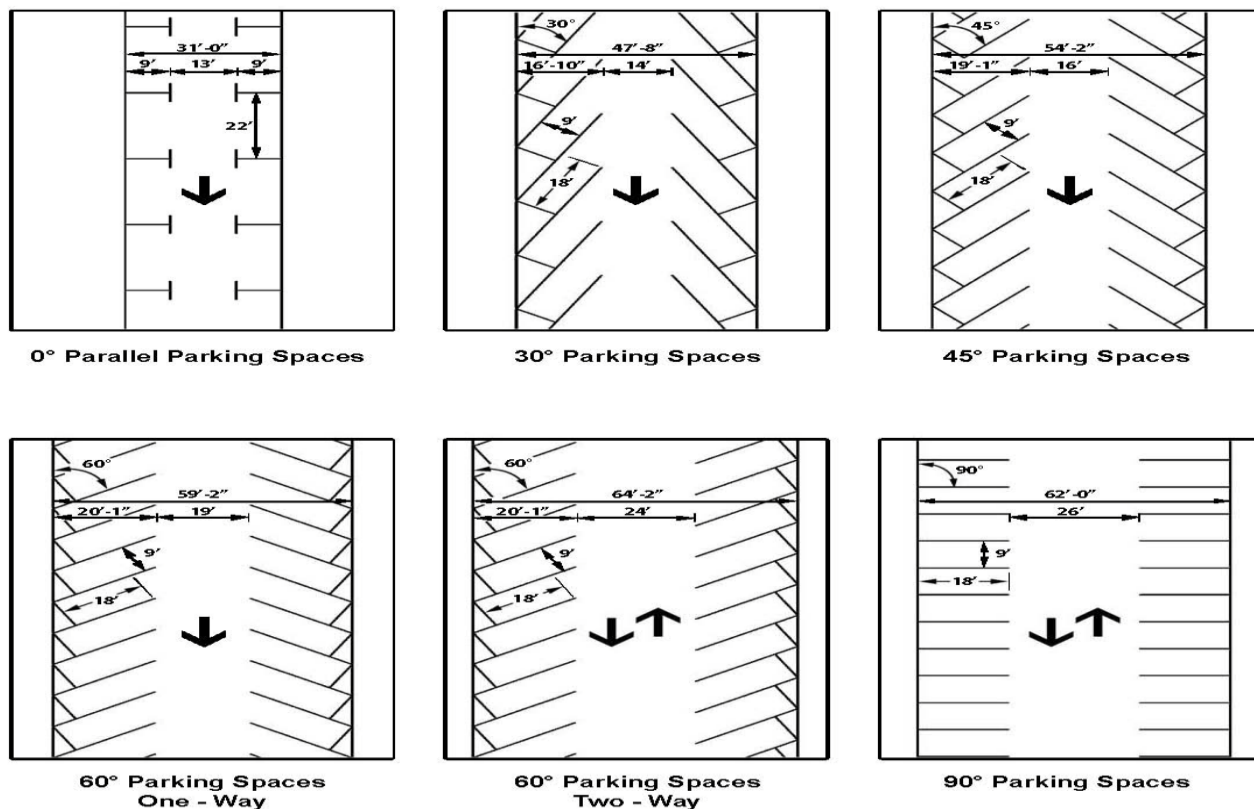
Minimum Dimensions for Common Parking Lot Layouts
